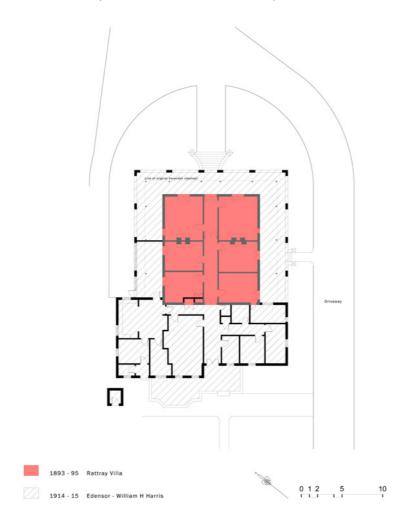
Schematic Floor Plan: Edensor at 203 Beecroft Road, Cheltenham 2119
